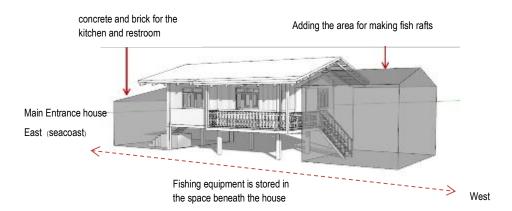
layout of the Ban Nai Tung house Style Source: Author
